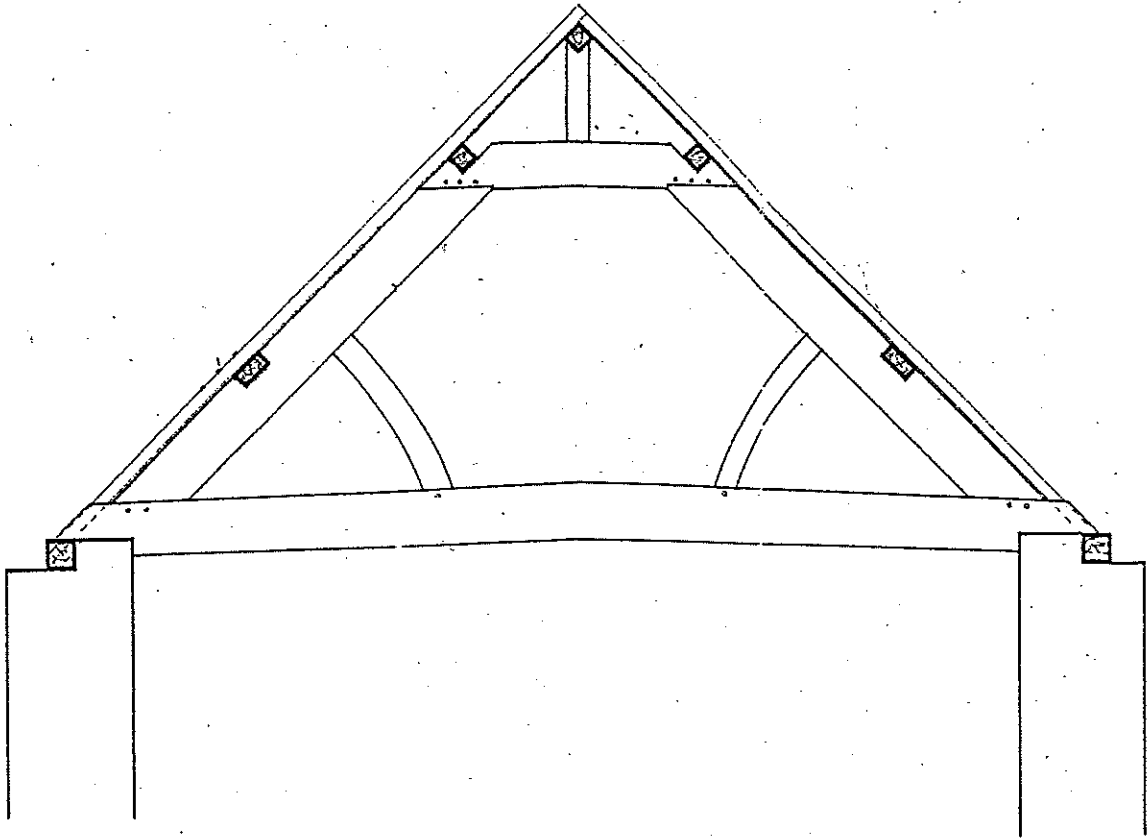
Plan to show approximate location of sampled timbers in the roof of the East range
